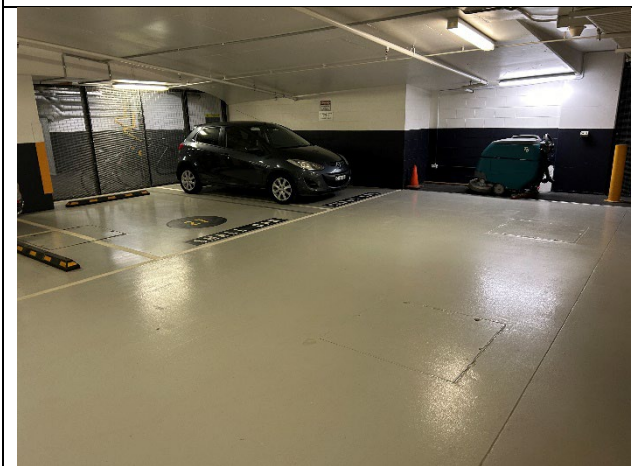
Level B2, carpark, adjacent spaces 24-28, underground sprinkler tank.
